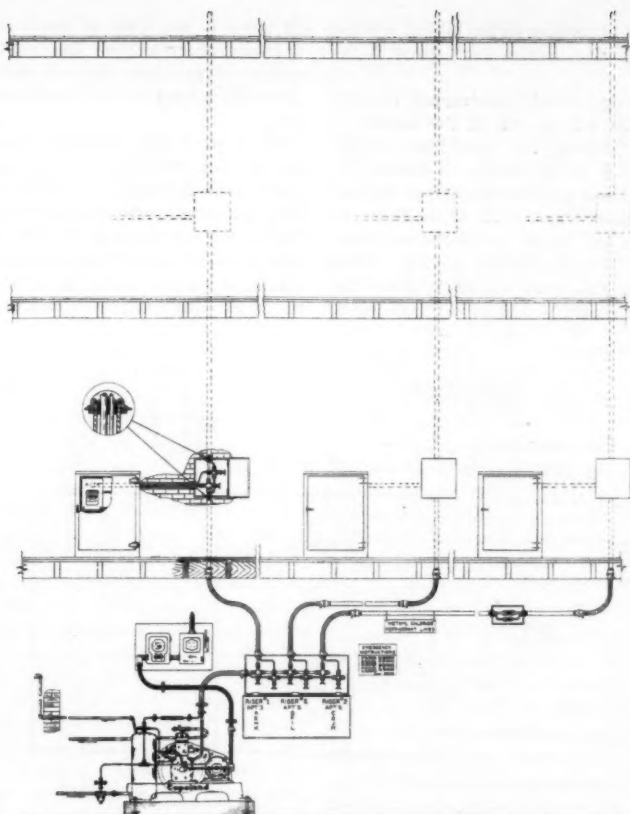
MULTIPLE APARTMENT INSTALLATION
